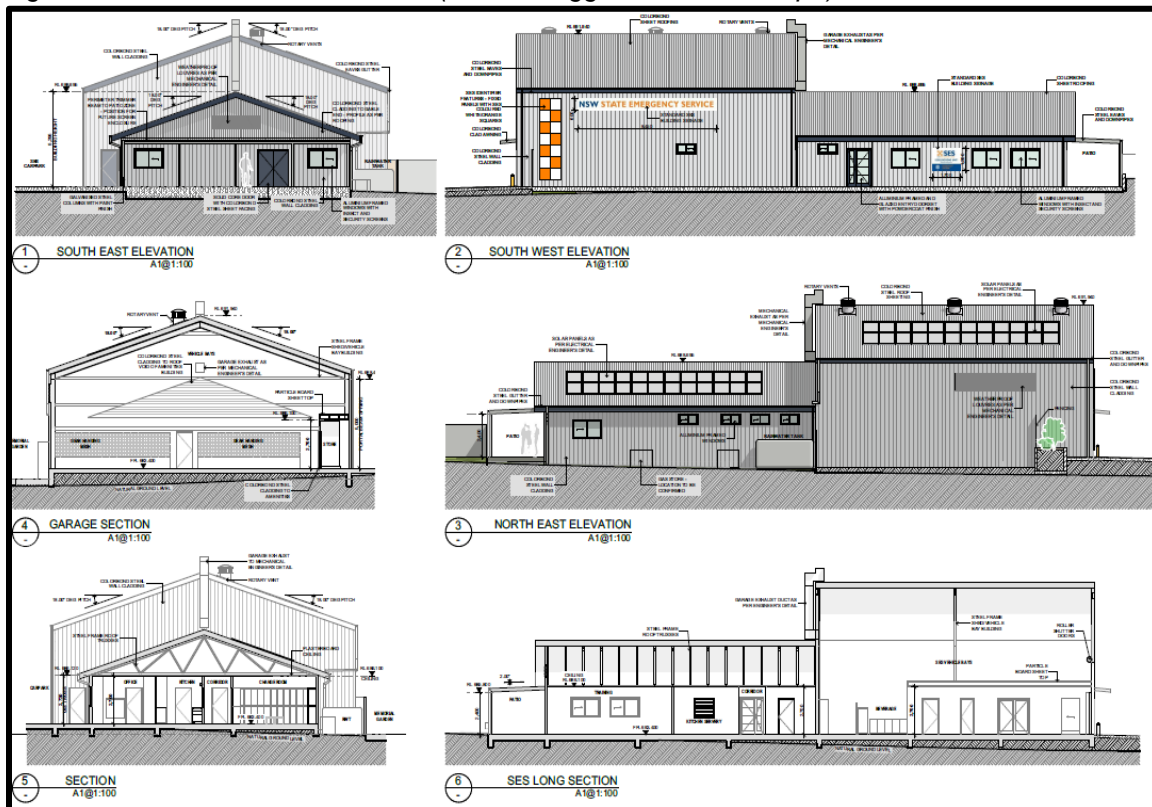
Elevations and Sections (Source: Figgis + Jefferson Tepa)
